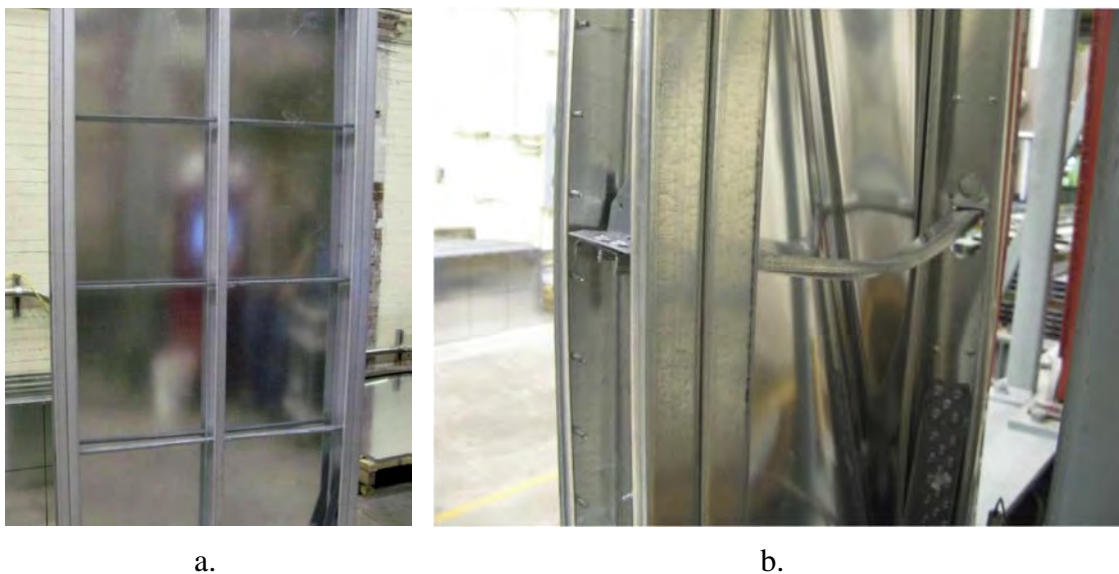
Bridging for shear walls: a. positions of bridging members (Ong-Tone (2009)) and b. flexural buckling of bridging used for chord studs (Balh (2010))
